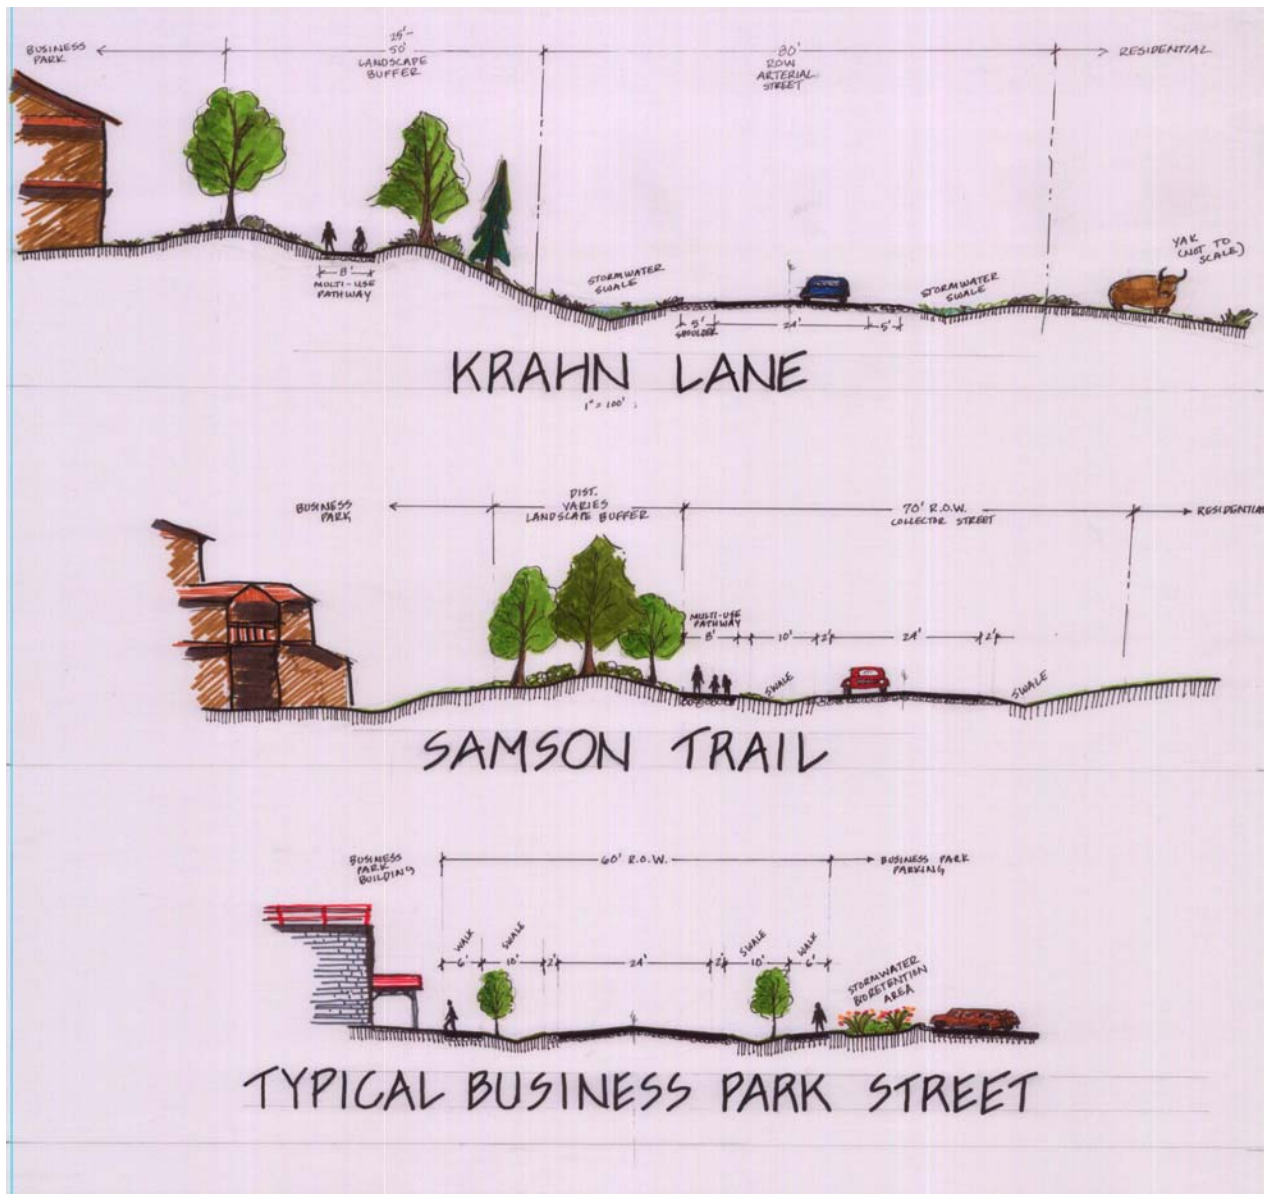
Street cross sections for Samson Trail, Krahn Lane, and a typical interior street
